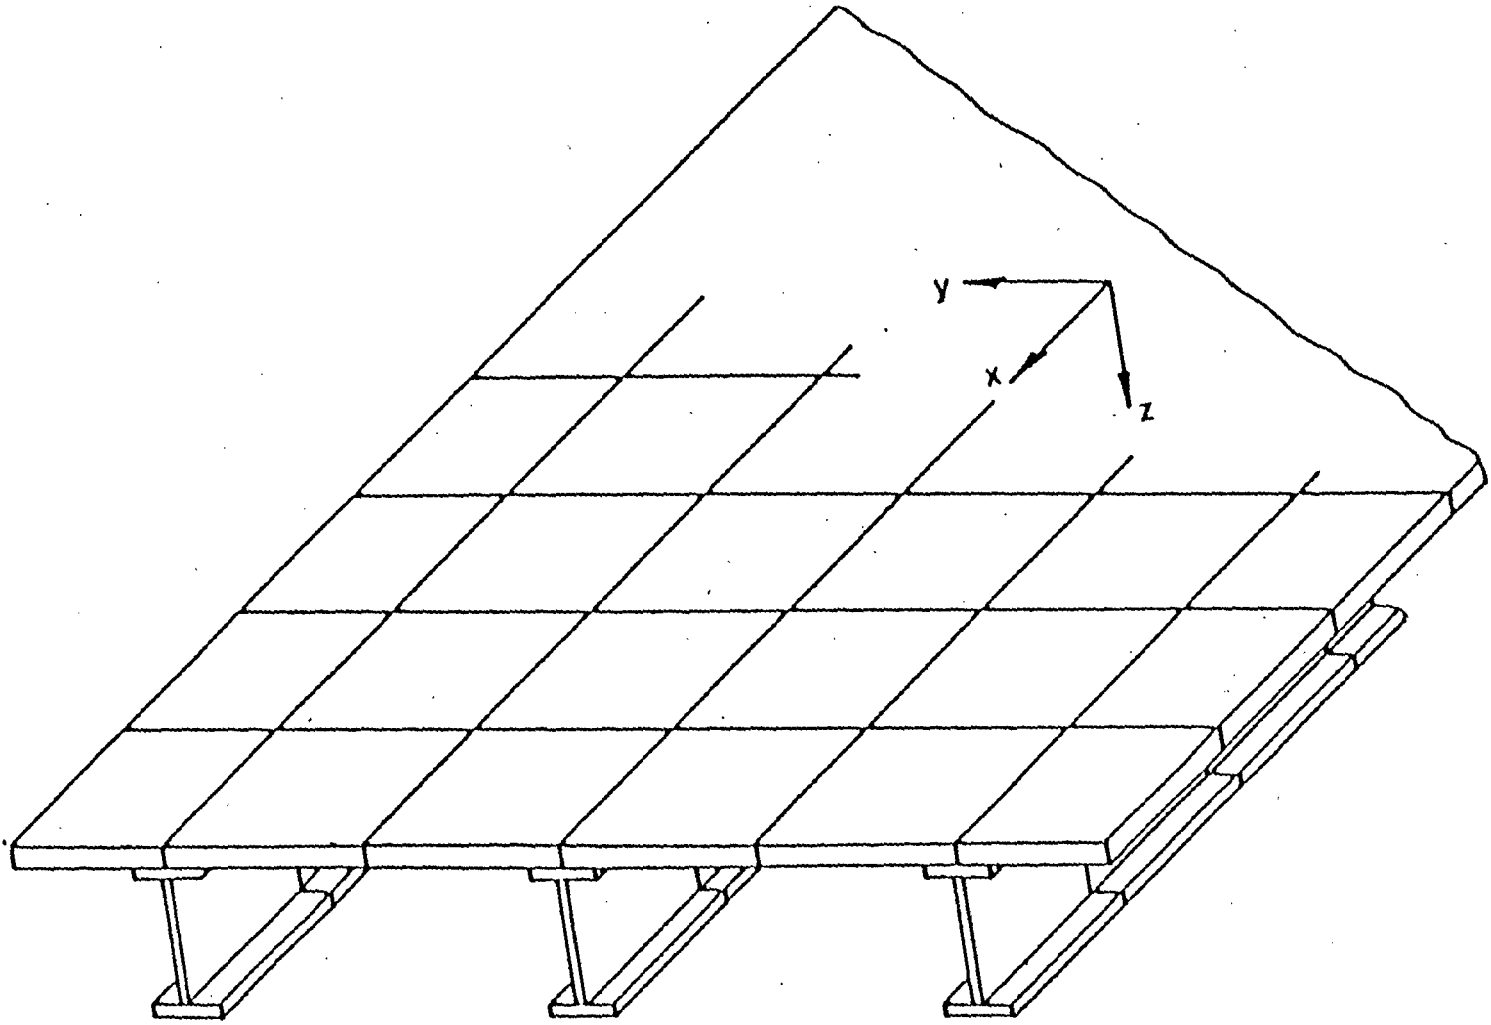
Typical Slab-Girder Highway Bridge Finite Element Discretization
